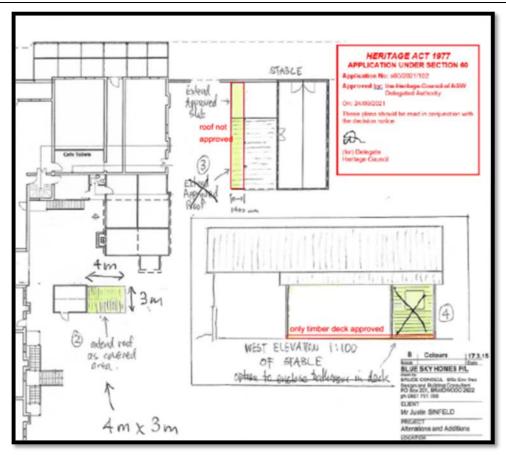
Proposed works – Extend roof to brick store, extend timber deck and slab to stables
